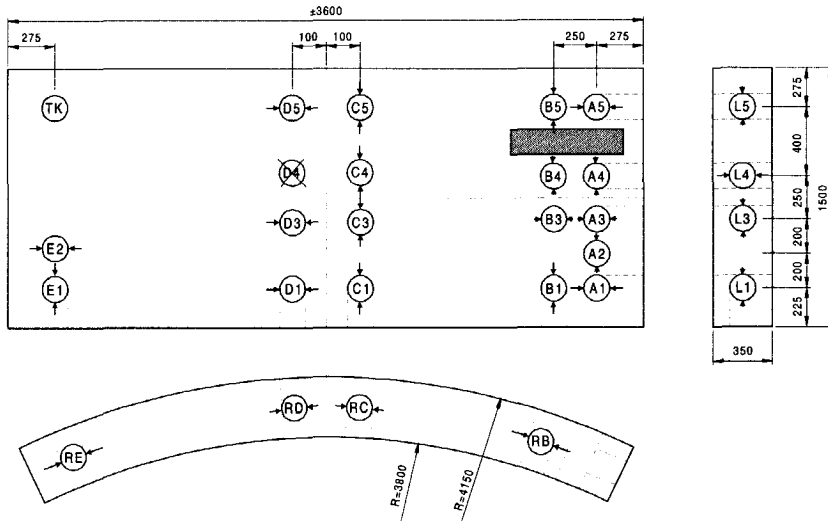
Layout of drilled core cylinders from prefabricated tunnel segment (dimensions in mm)
